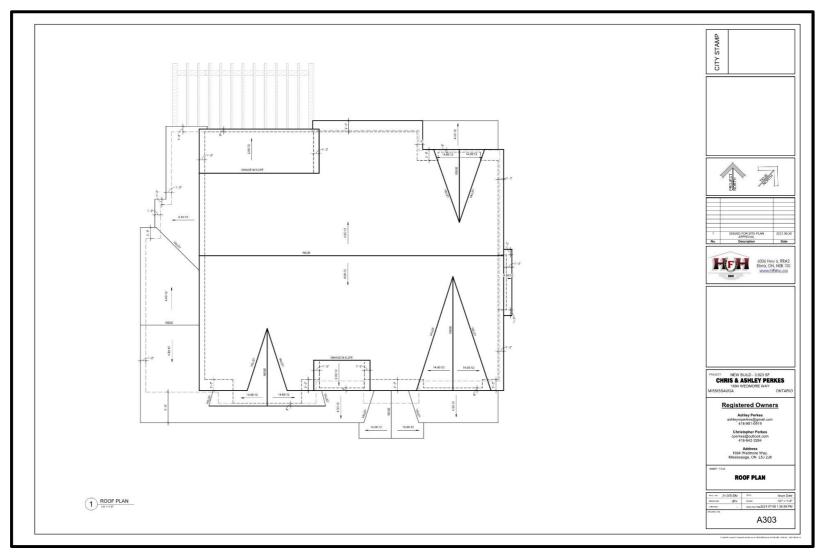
Proposed Development – Roof Plan (H4H Inc. 2021)
